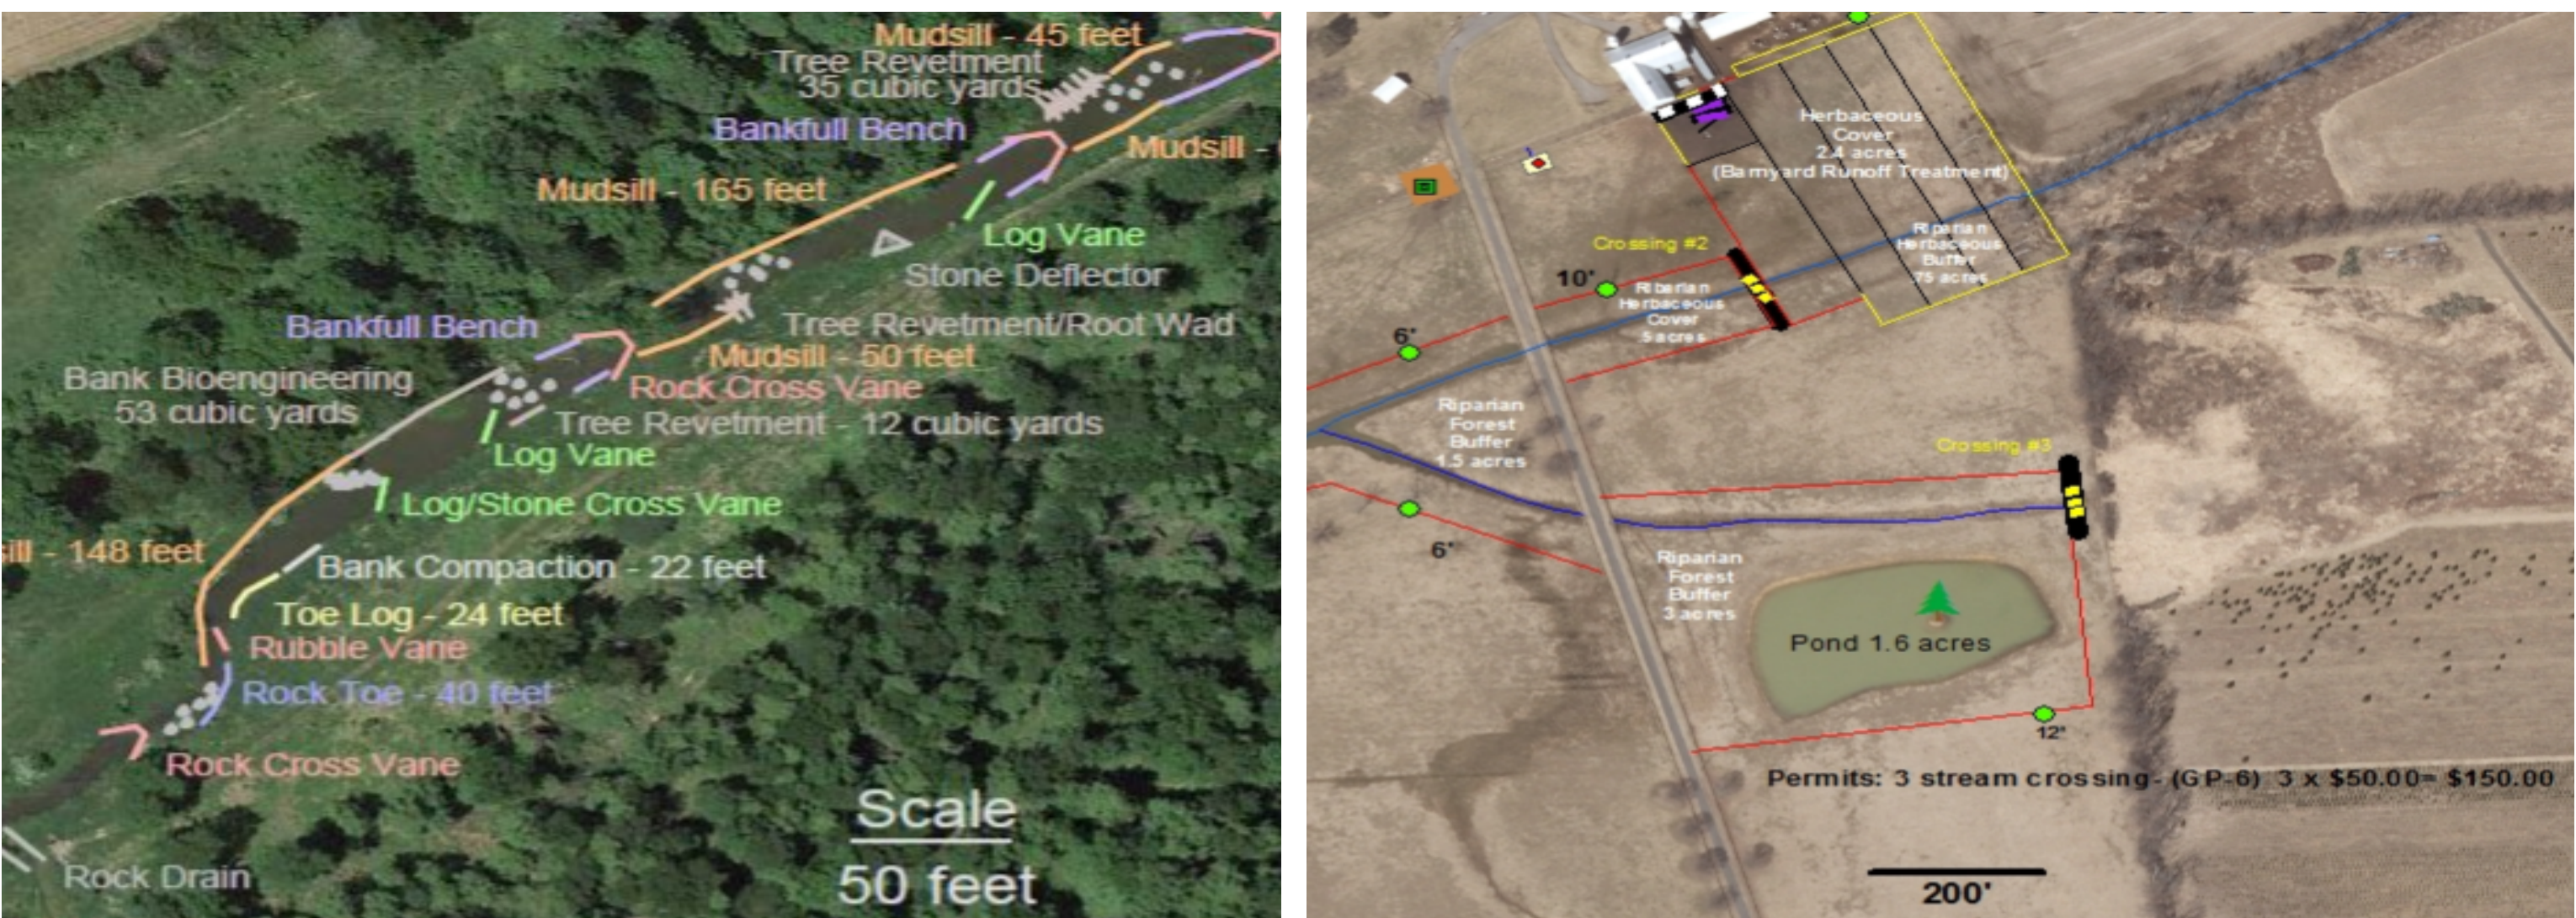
"As Built" site plan at Elk Creek, Pointer Haven location indicating primarily in-stream BMPs
